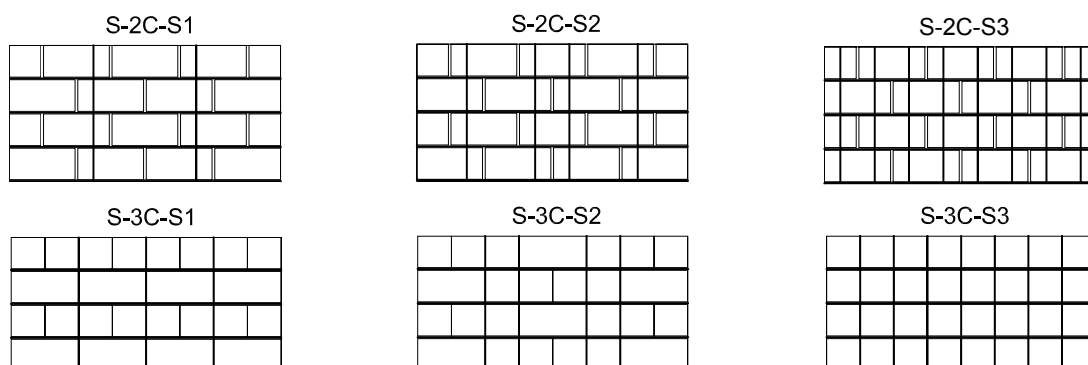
Location of vertical reinforcements in masonry beams with 4 blocks of length.
